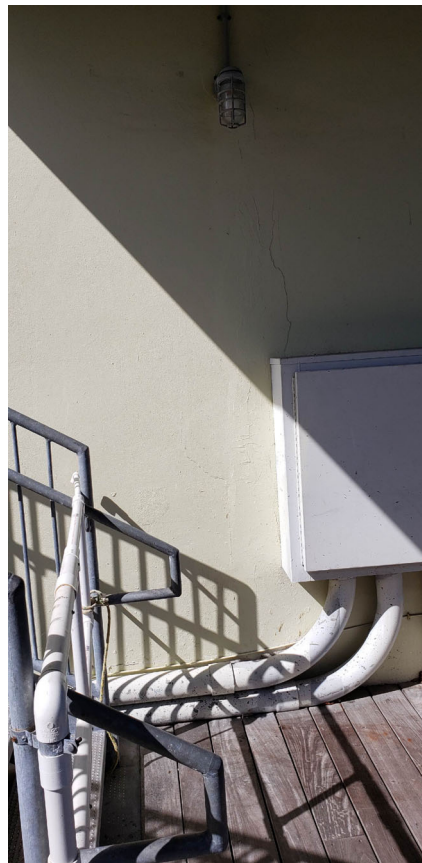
Location 29: Concrete spalling in the column and cracks developing.
